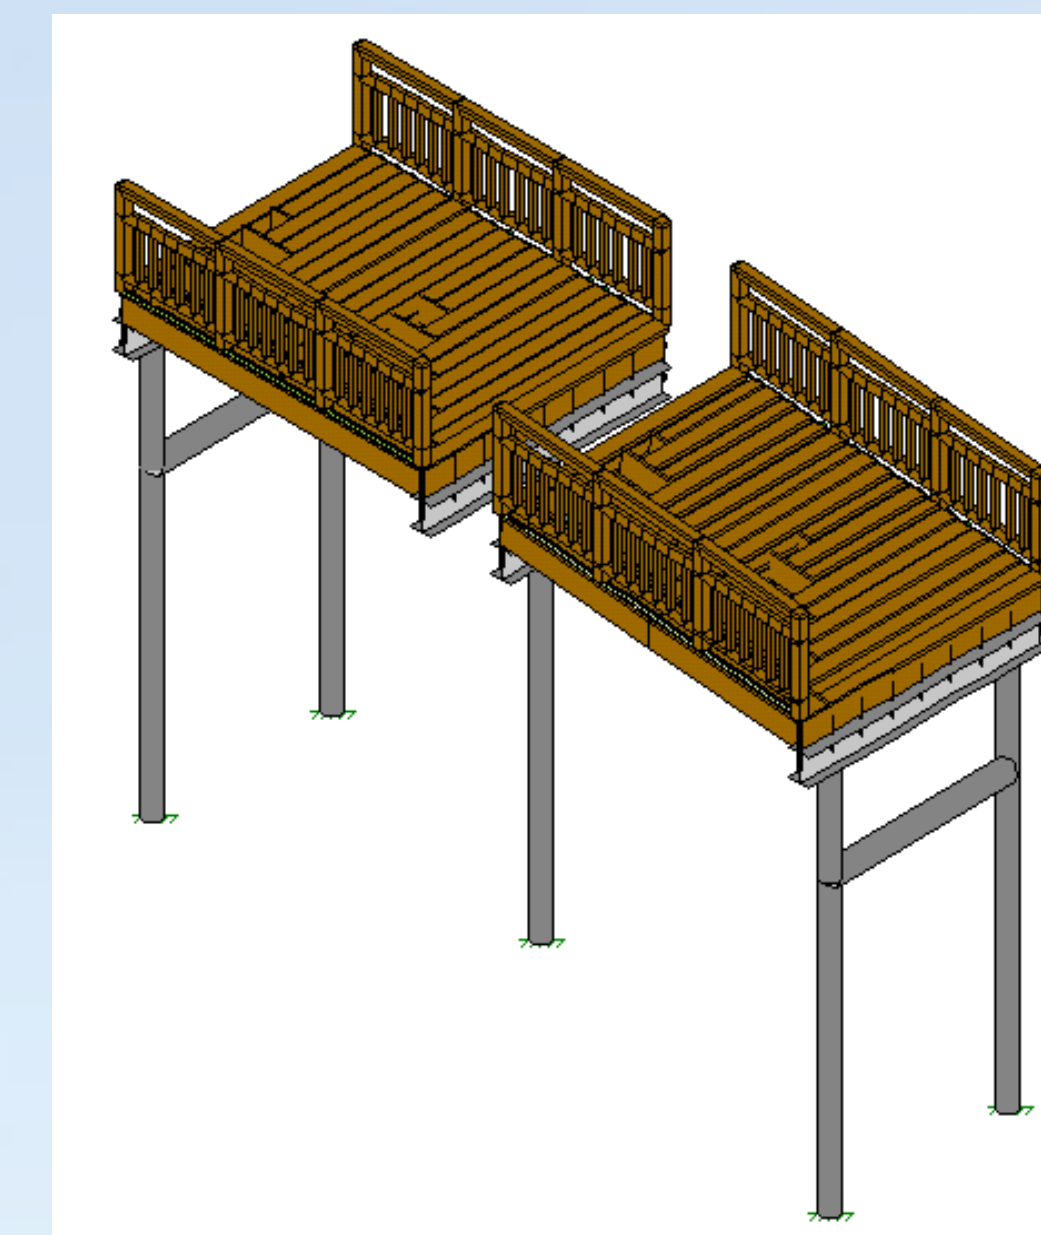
Two 10-ft long, 8-ft wide boardwalk sections.
